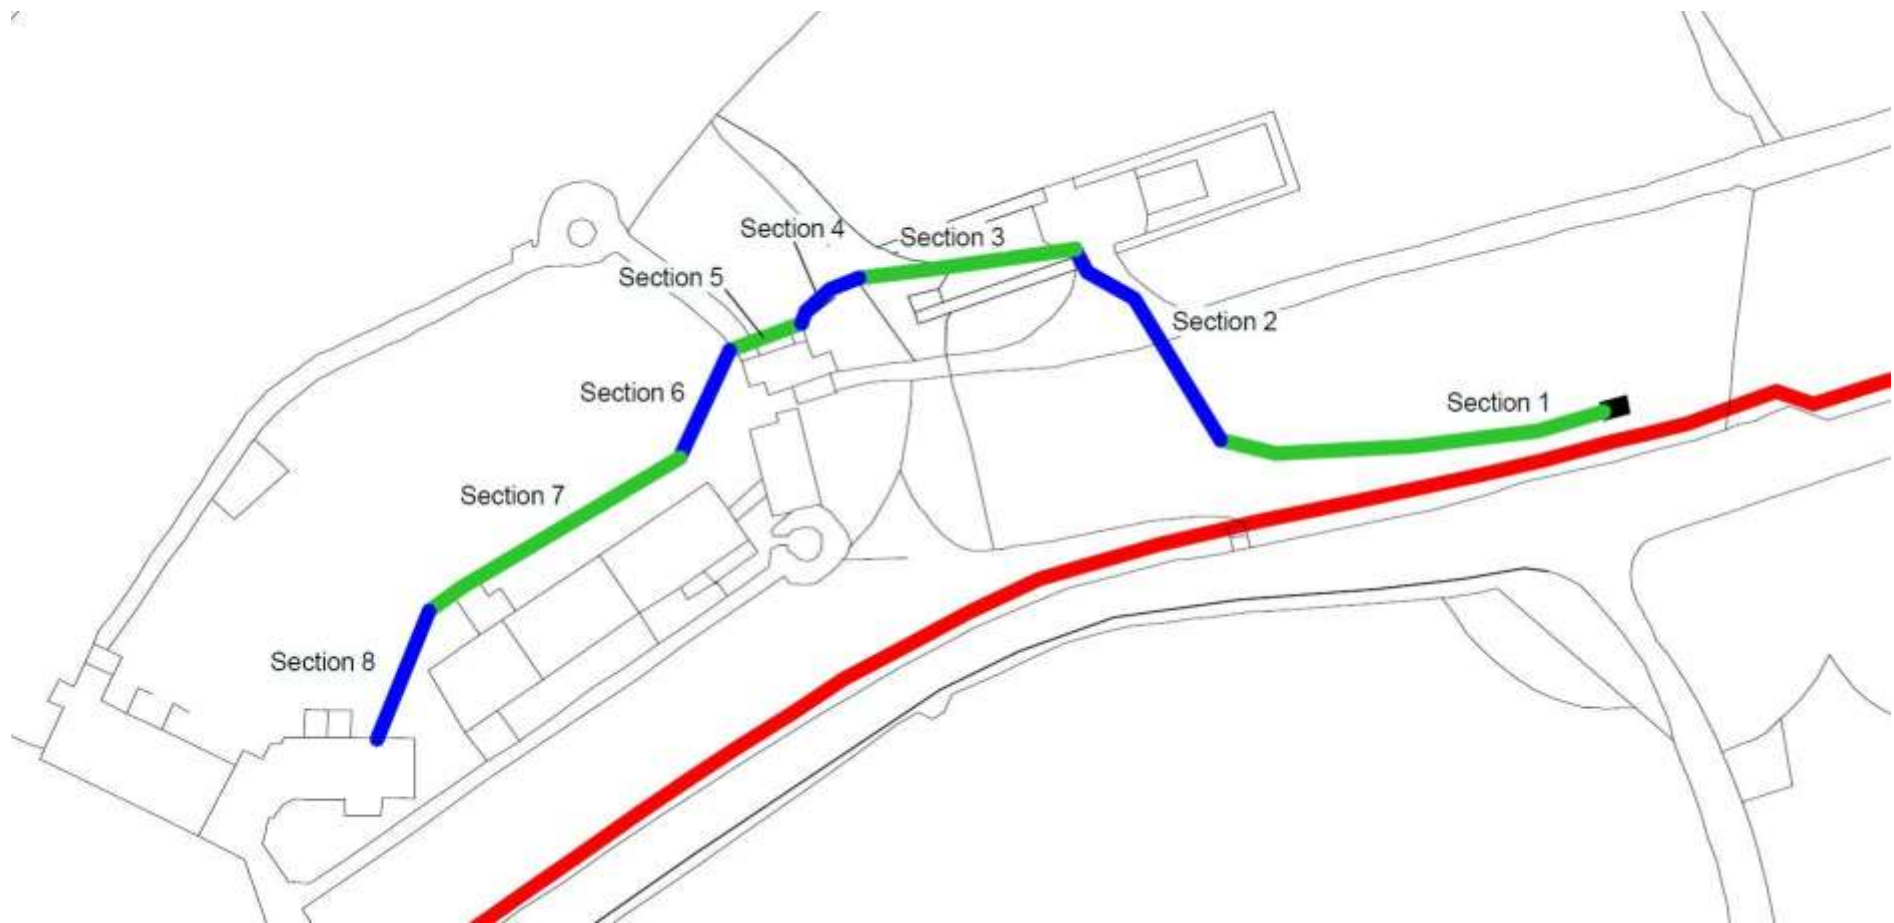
Plan showing the different Sections of the cable trench referred to in the text
